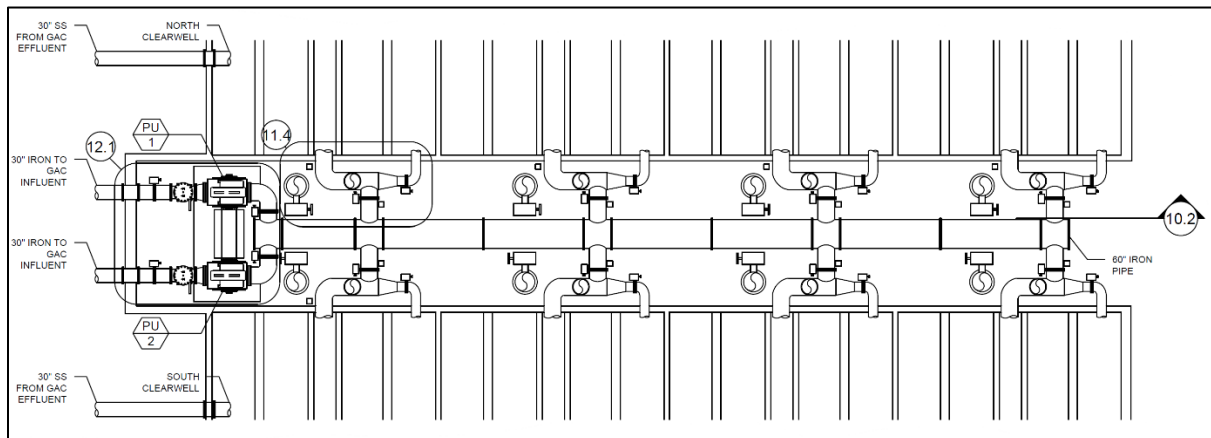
Modified Clearwell Basement From Forefront Consulting Drawing Set Page 9, Appendix 9.6
